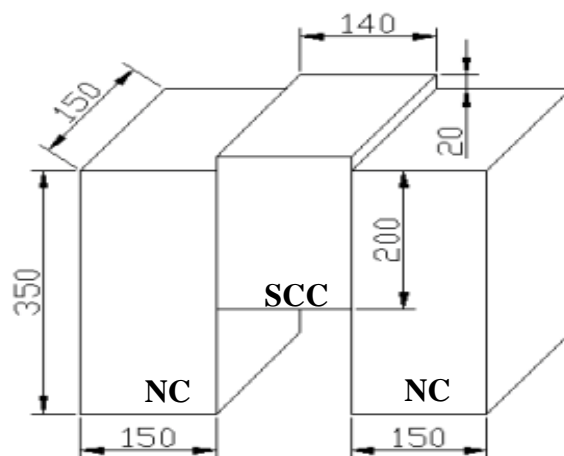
Dimensions of push-off specimen (Dimensions in mm)
